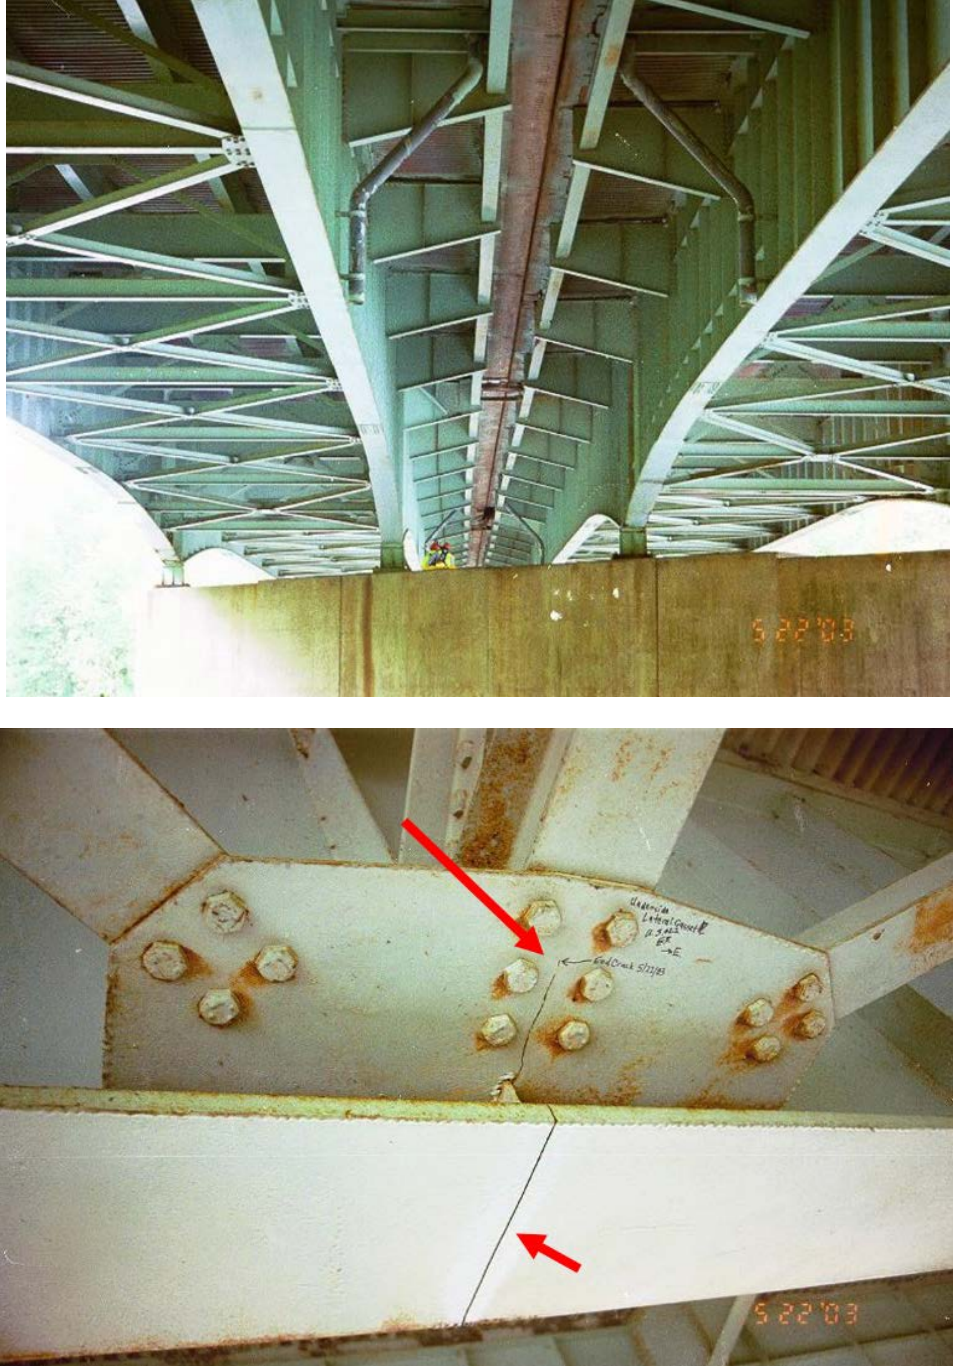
Fracture of the US 422 Bridge; lateral bracing configuration (top) and bottom view of fractured flange and gusset plate (bottom).
